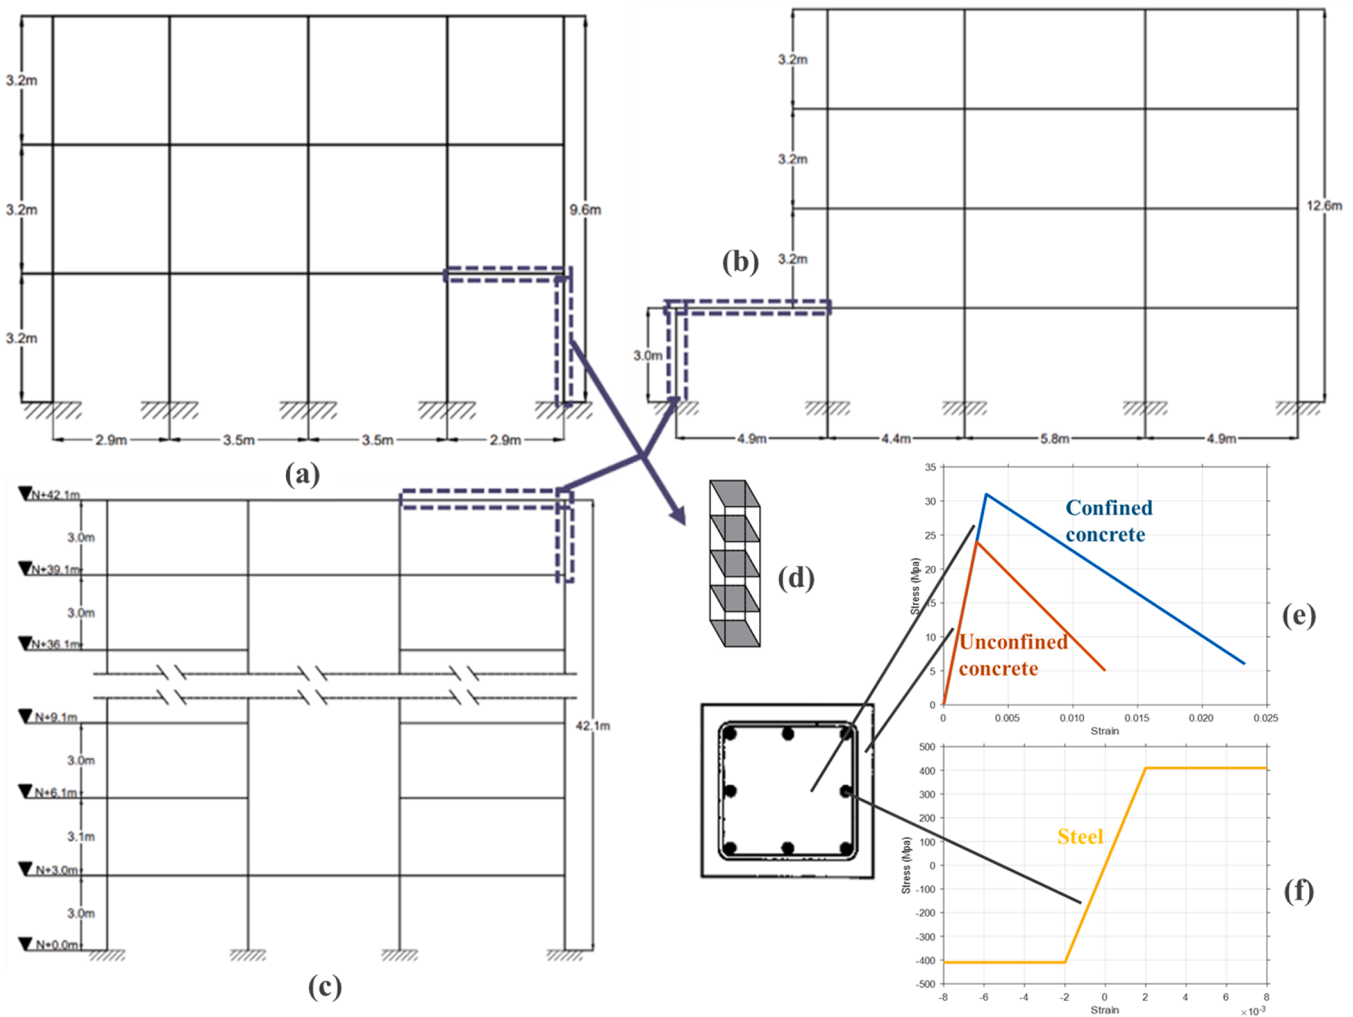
Numerical models of the 3 F, 4 F and 14 F buildings. (a) Elevation view of the 3 F building, (b) Elevation view of the 4 F building, (c) Elevation view of the 14 F building, (d) Fiber sections beams and columns, (e) Backbone curve of unconfined and confined concrete of the columns, and (f) Backbone curve of the rebar.
